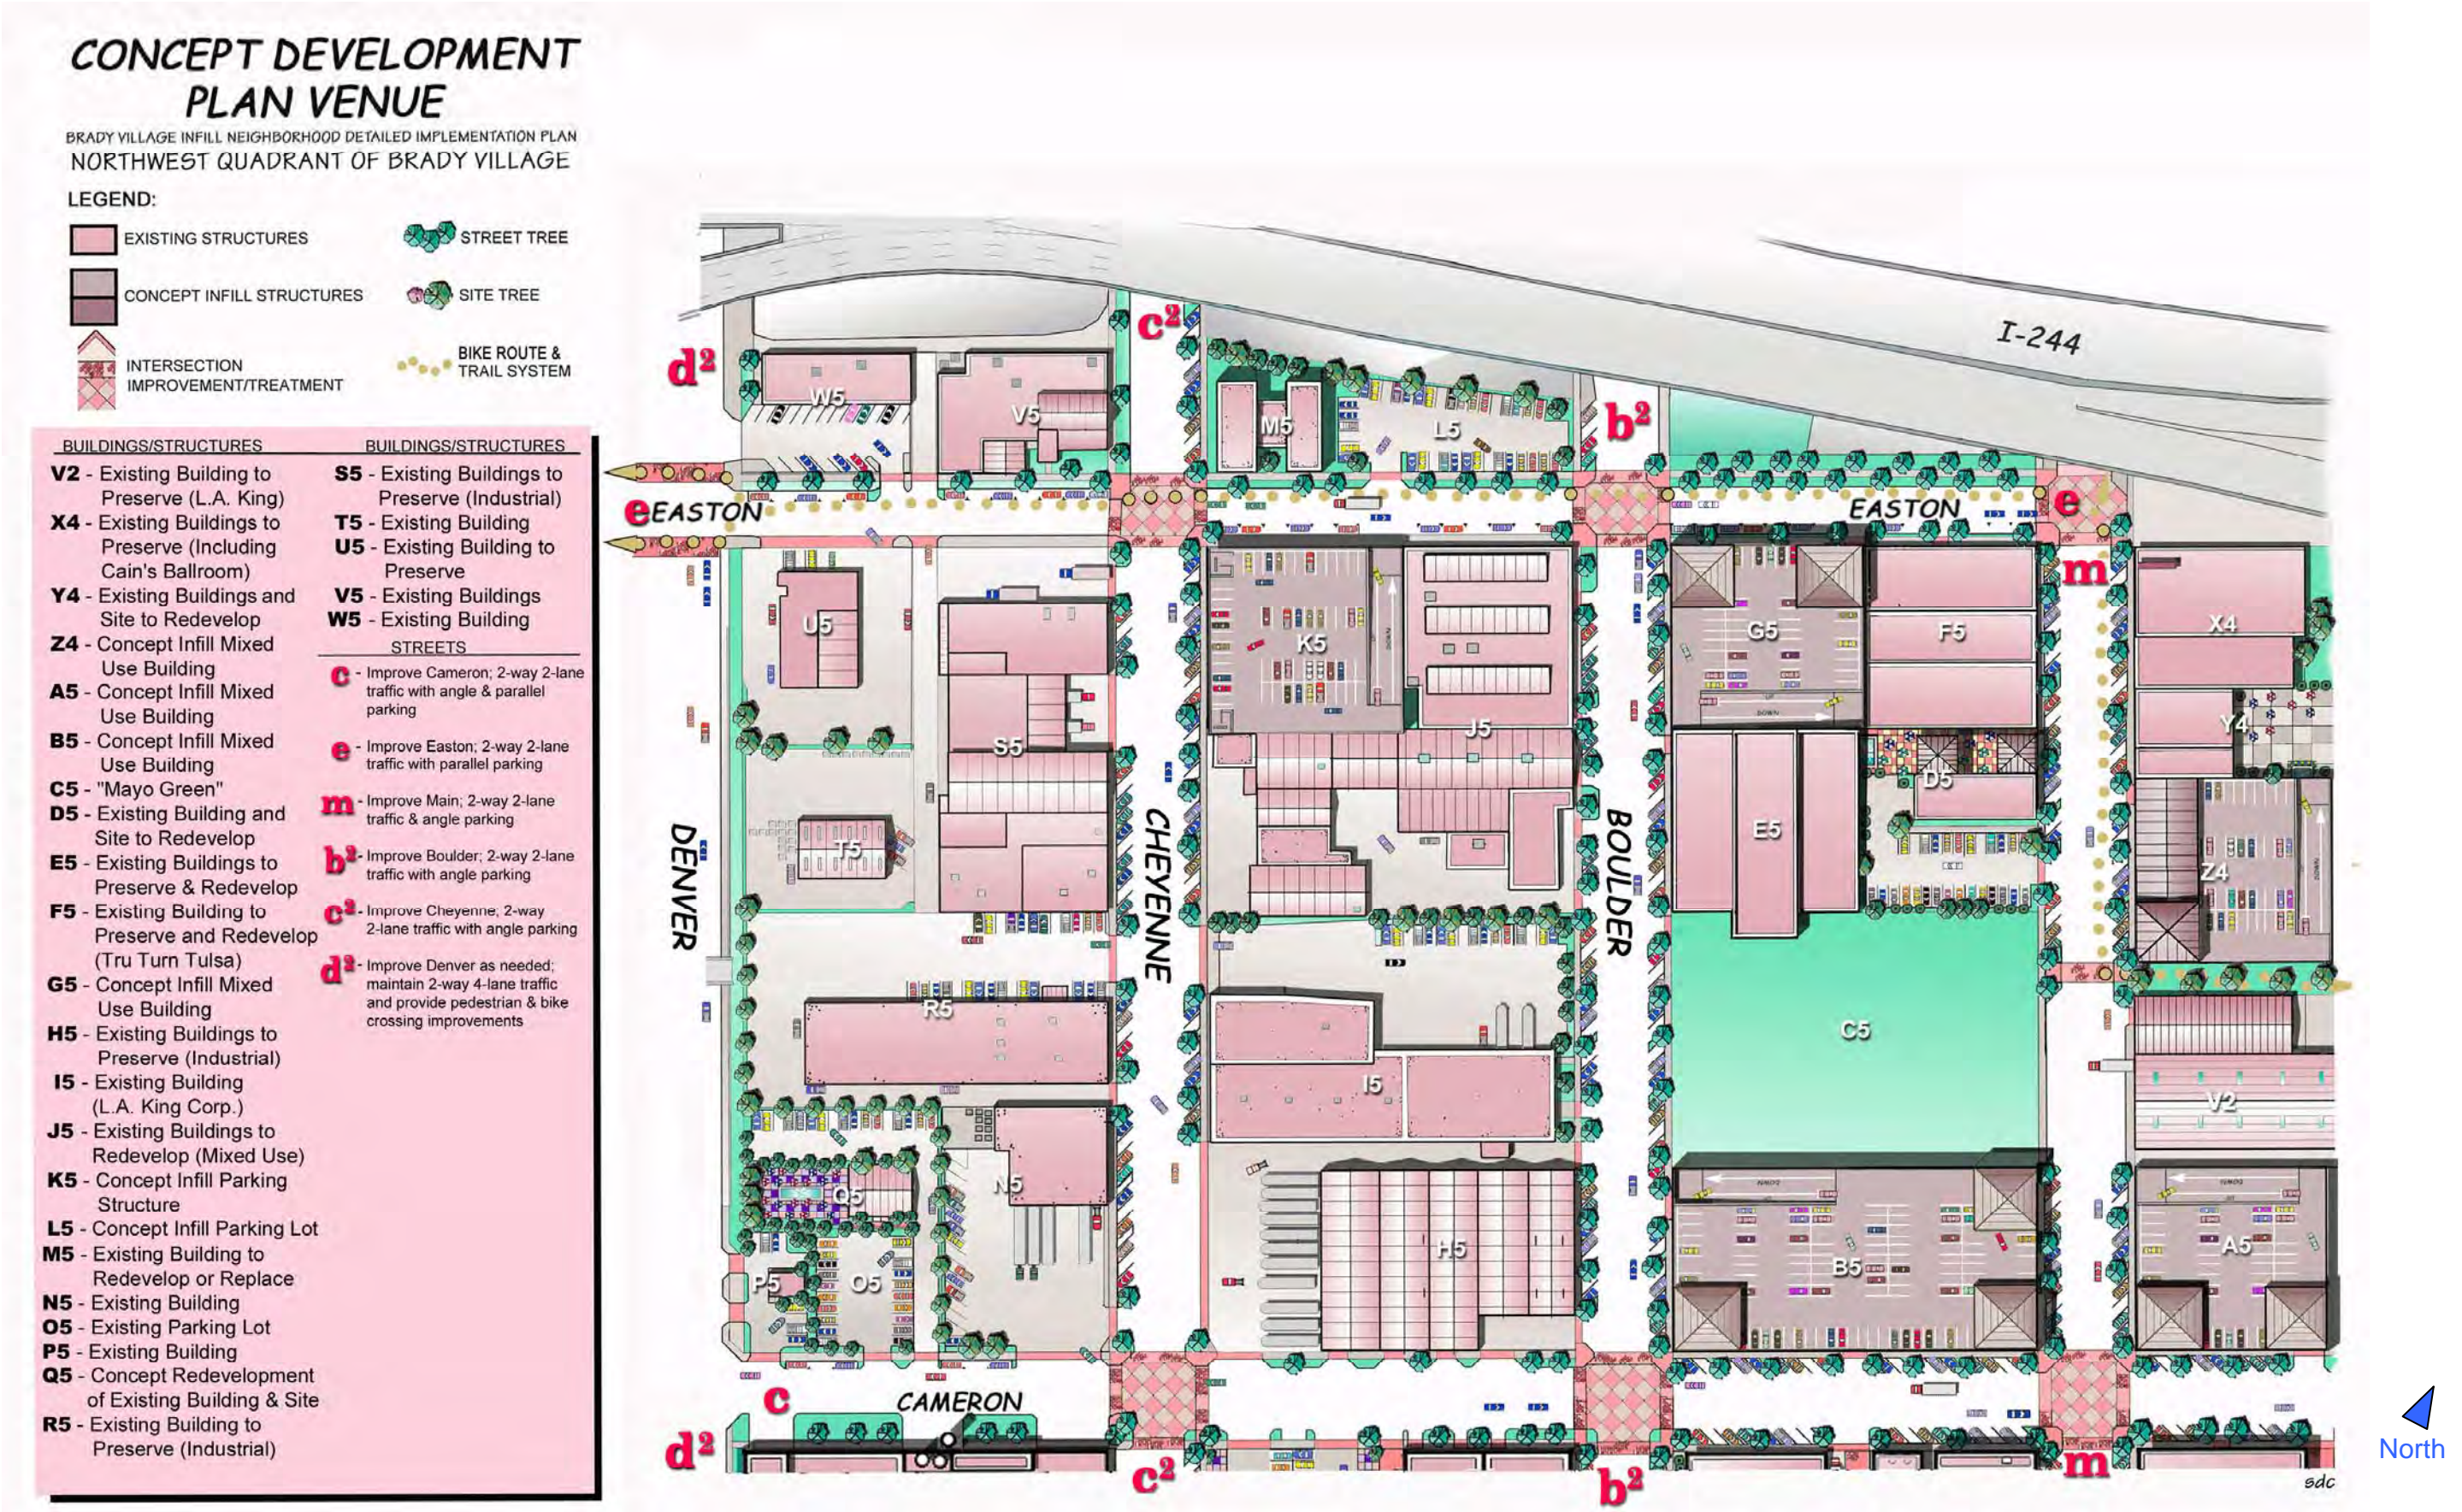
CONCEPT DEVELOPMENT PLAN VENUE - NORTHWEST QUADRANT
